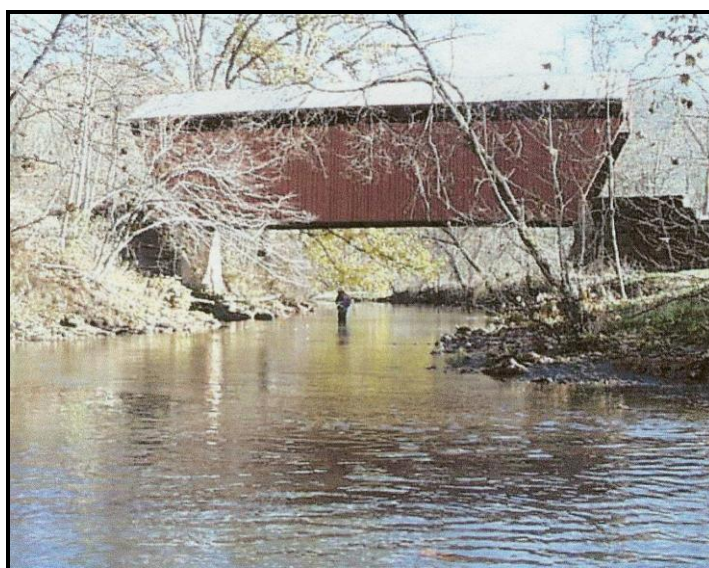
Fletcher Covered Bridge (Bridge 17-005/29-000.01) in Harrison County, constructed in 1801, illustrating a covered bridge (photograph courtesy of West Virginia Division of Highways)
